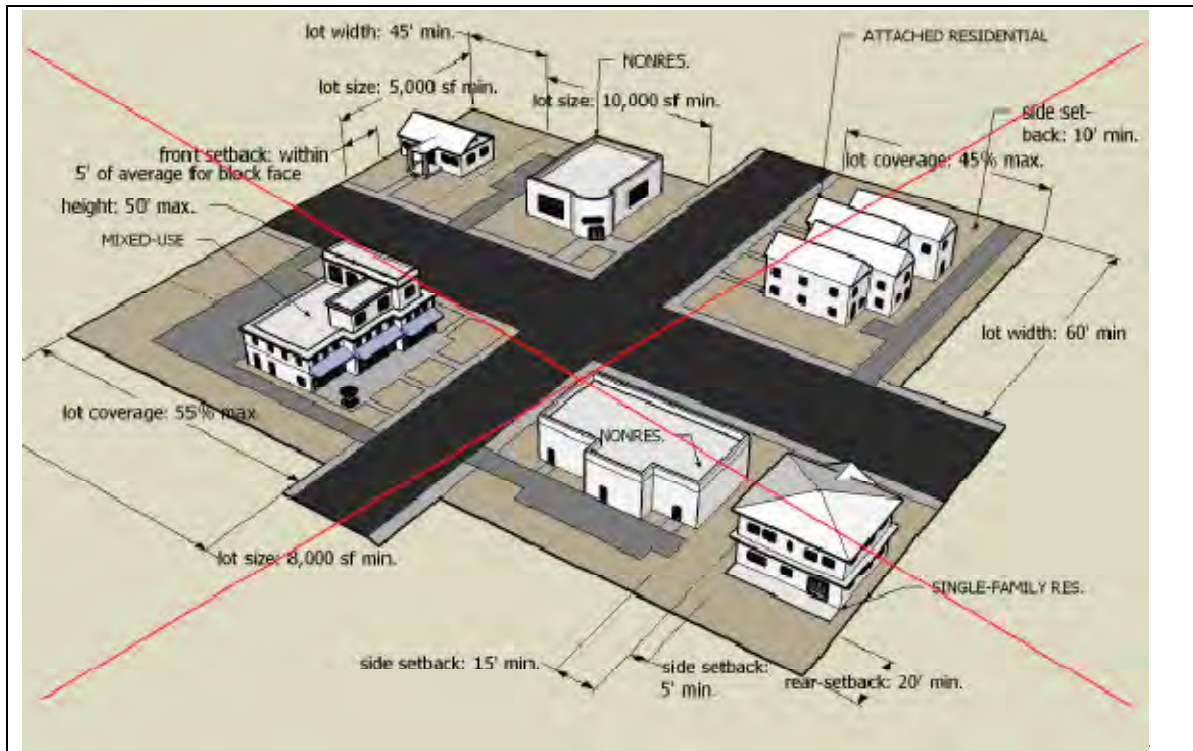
E.3.e: NC Typical Building/Lot Configuration
